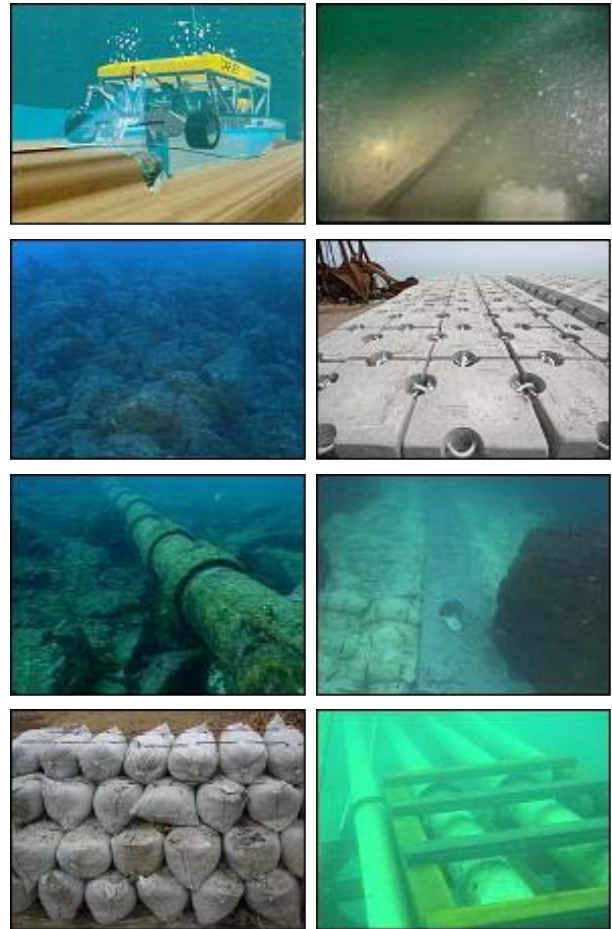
Protection method of submarine cable. (The left-rightdirection from top : Trenching, concrete mattress, Rock berm, FCM, Cast iron pipe, U-duct, Concrete bag, Pole artificial reef structure)
